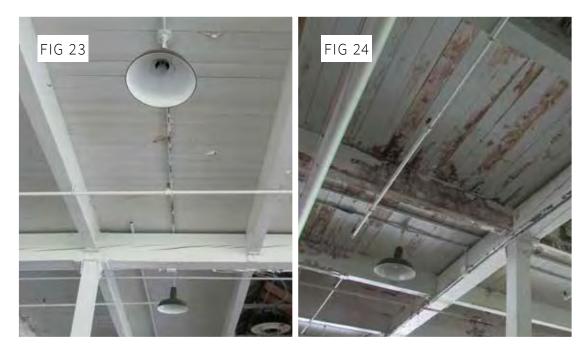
Condition of wood structural elements showing minor paint peeling (ERA, 2016).
